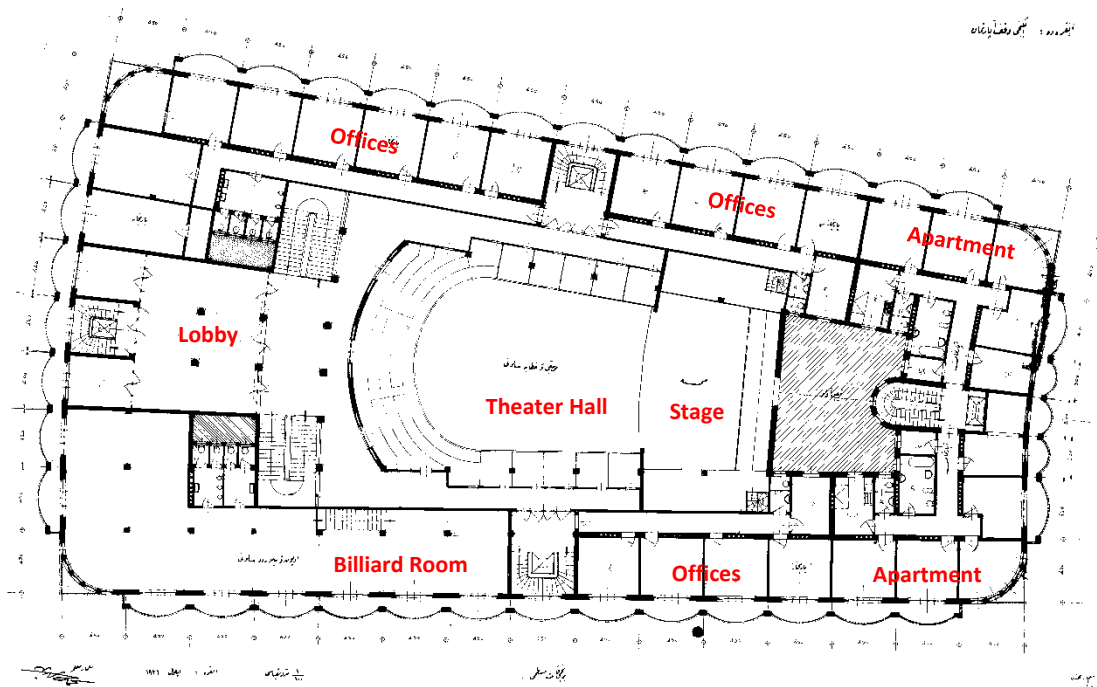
İkinci Evkaf Apartmanı Building First Floor Plan [20].
